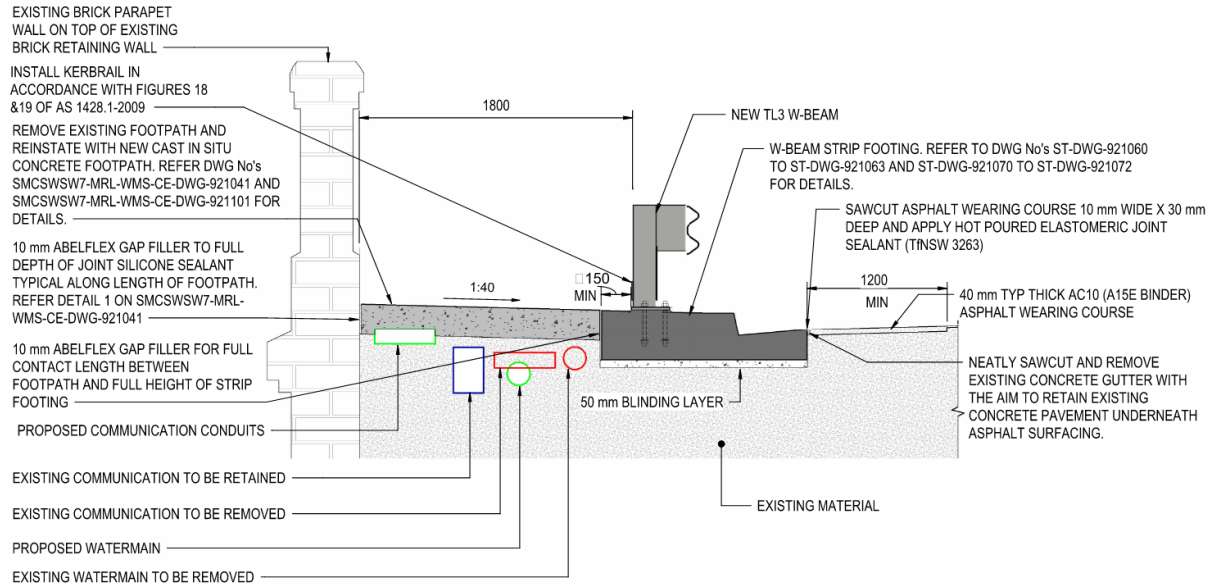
Cross section of the proposed countryside footpath behind TL3 w-beam
